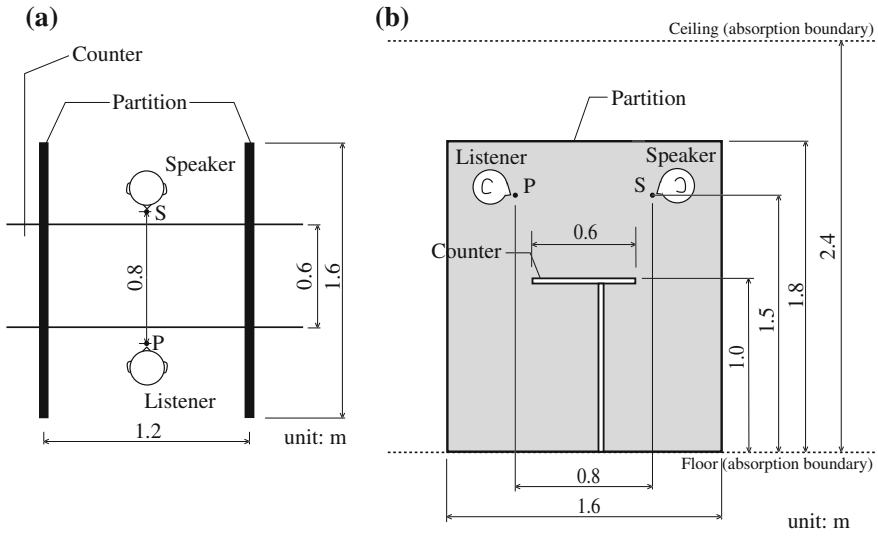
Floor and section plan around speaker and listener. a Floor plan. b Section plan
